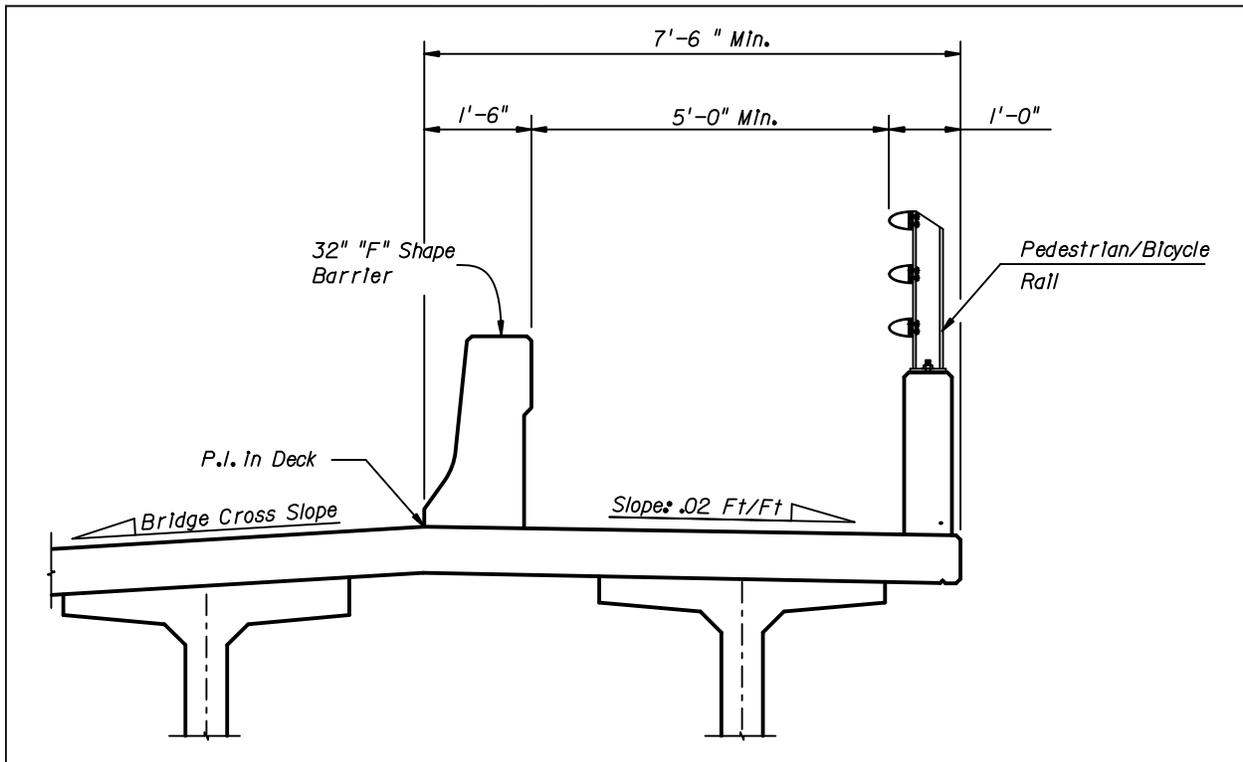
Section at Sidewalk With Bridge Cross Slope Greater Than 2% (3 of 3)
